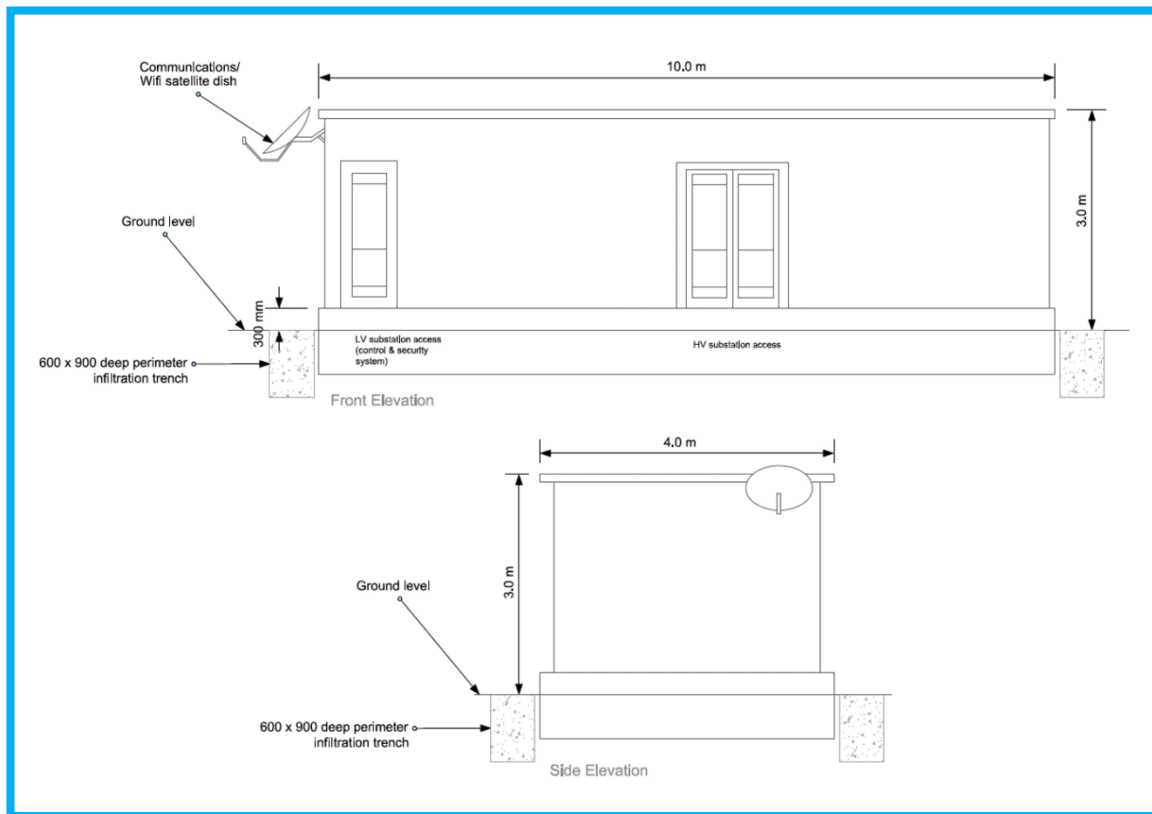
Customer substation 10m x 4m in plan with perimeter permeable gravel infiltration trench 600mm wide and 900mm deep.
